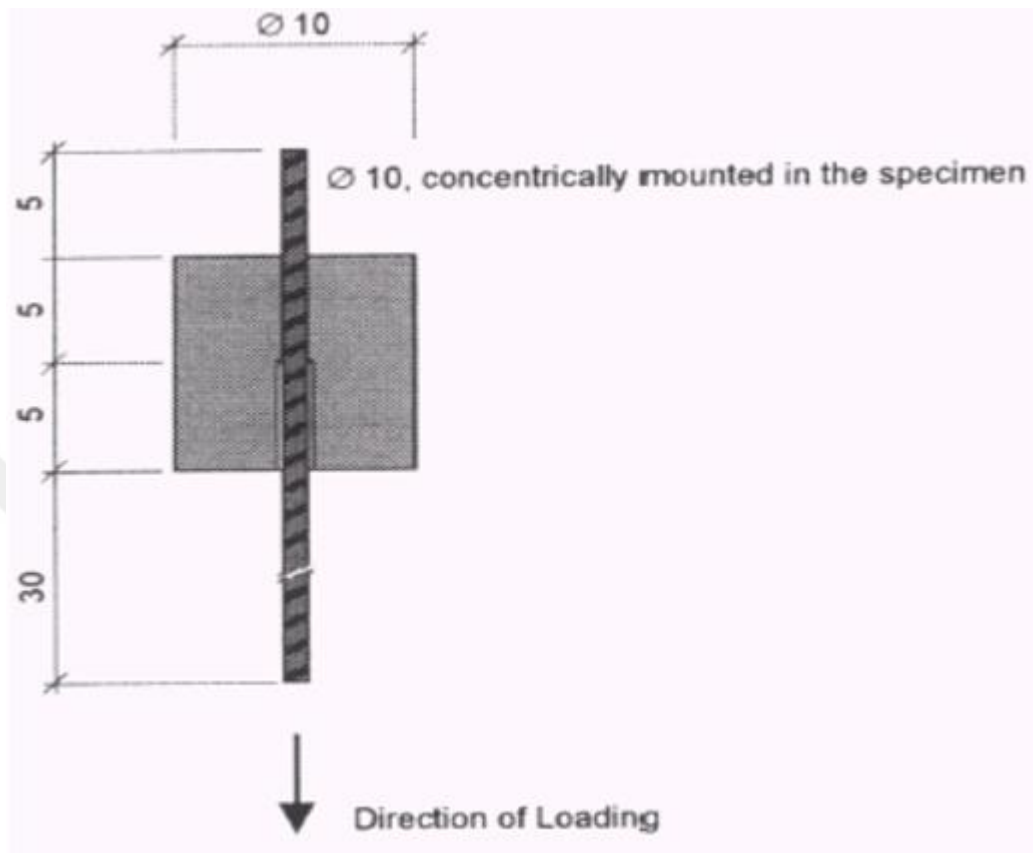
Pullout specimen (Dehn et al., 2000).
